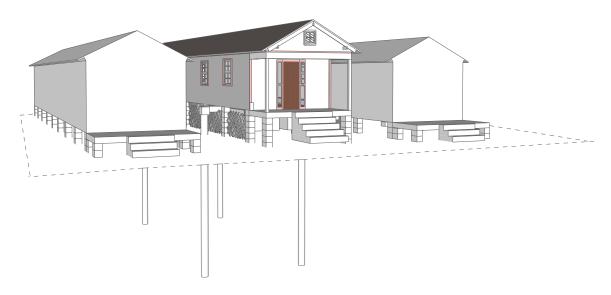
Shotgun House on Buoyant Foundations - Normal Position
